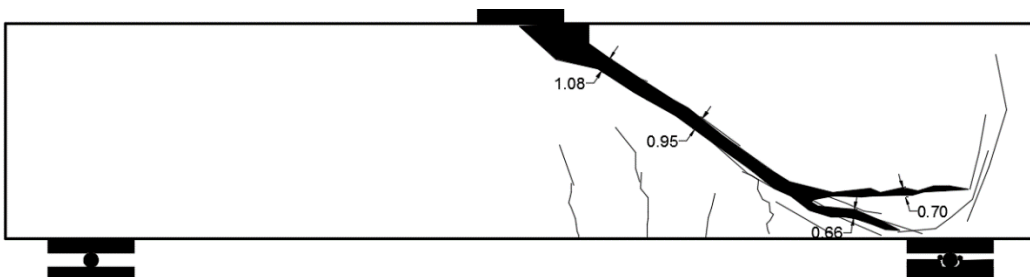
Crack pattern at failure for SNFRC 0.75% beam #16
